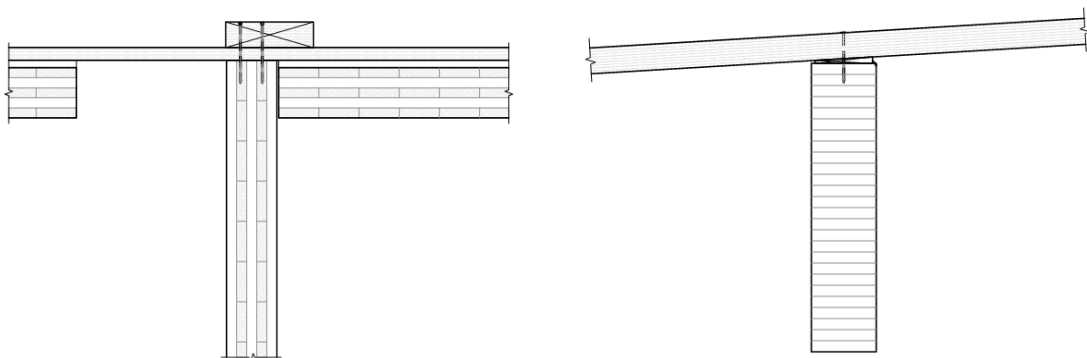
Academic bar roof diaphragm to shearwall connection (left). Atrium roof sheathing at glulam beam (right)
